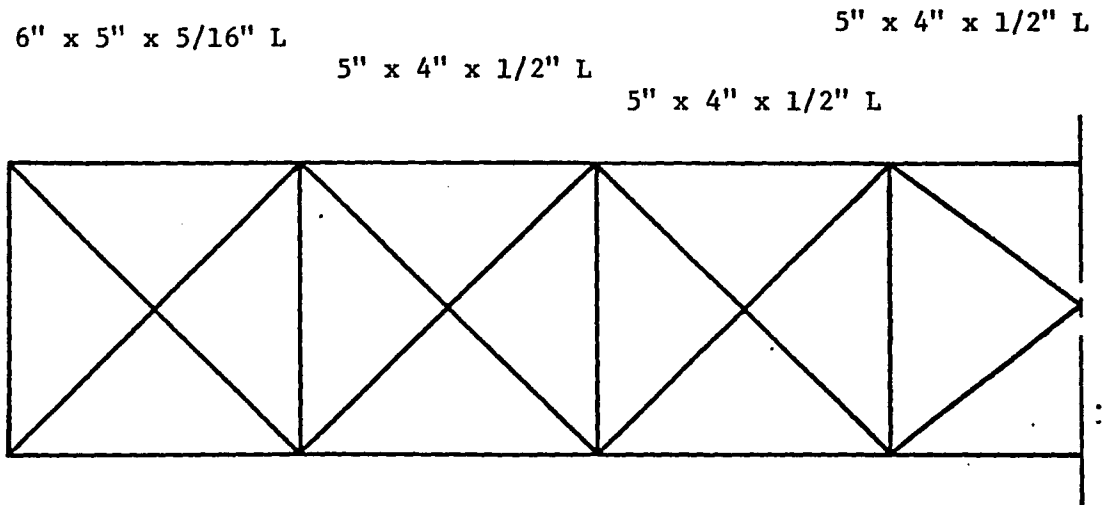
Top and Bottom Wind Bracing Plan Views
